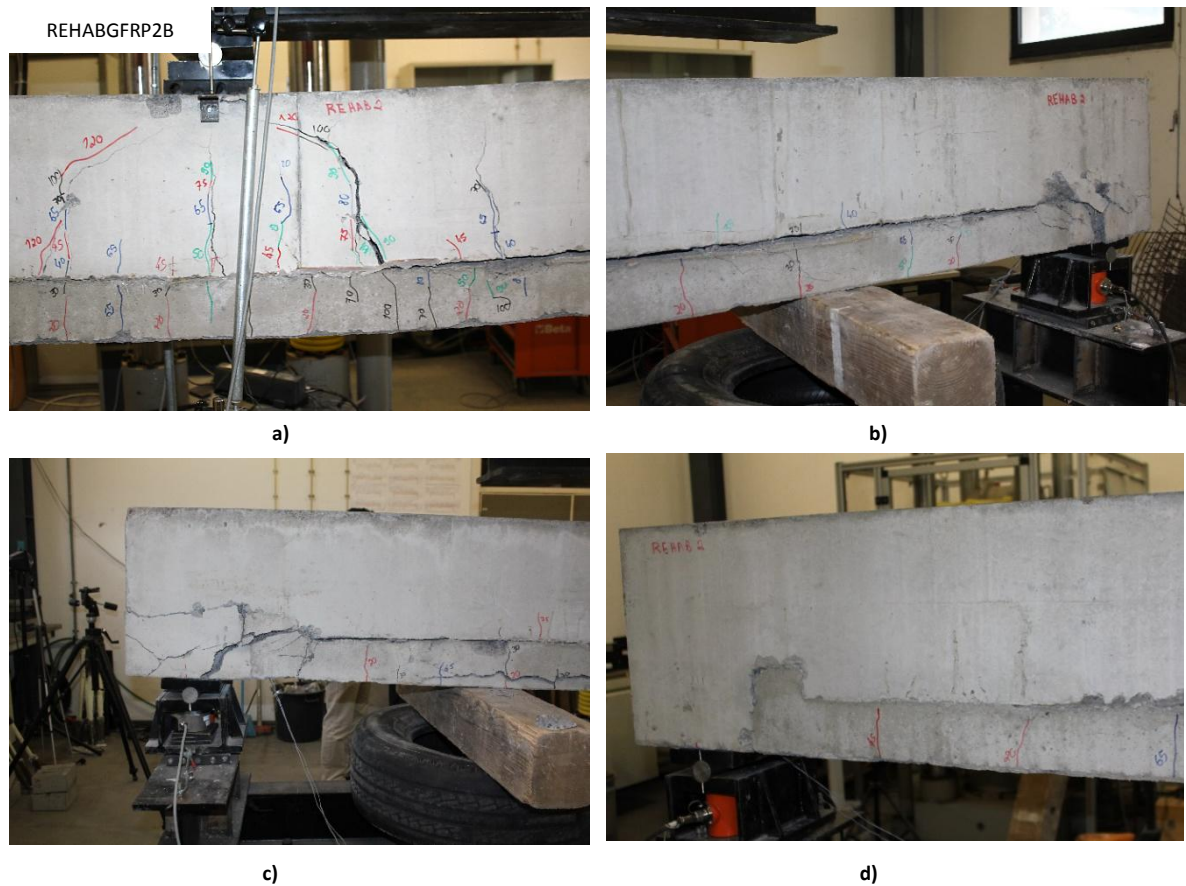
REHABGFRP2B: a) mid-span detail; b) right support front detail; c) right support back detail; d) left support detail
